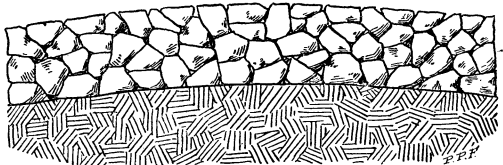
Stone on a macadam road firmly wedged and packed together. Small stones, gravel, dirt, or sand if mixed with the stone or spread on the surface before rolling, prevent its being thoroughly wedged and packed.
